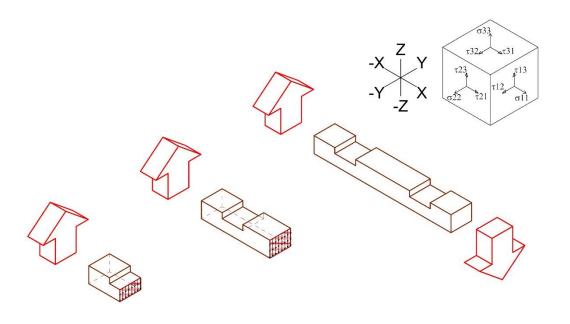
Cross Piece -Shear on  $\ Z$  axis
